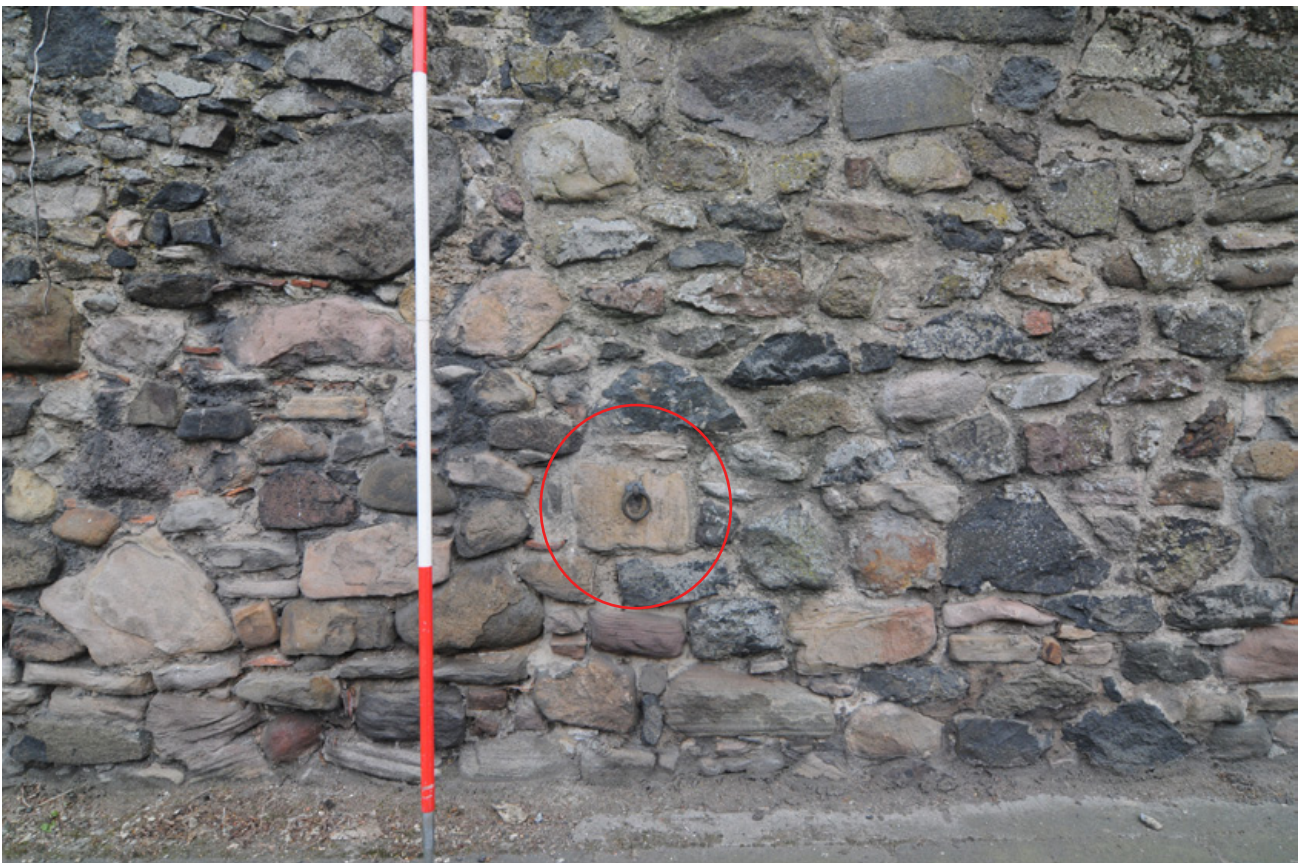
North-facing elevation tethering ring (Feature 1).
